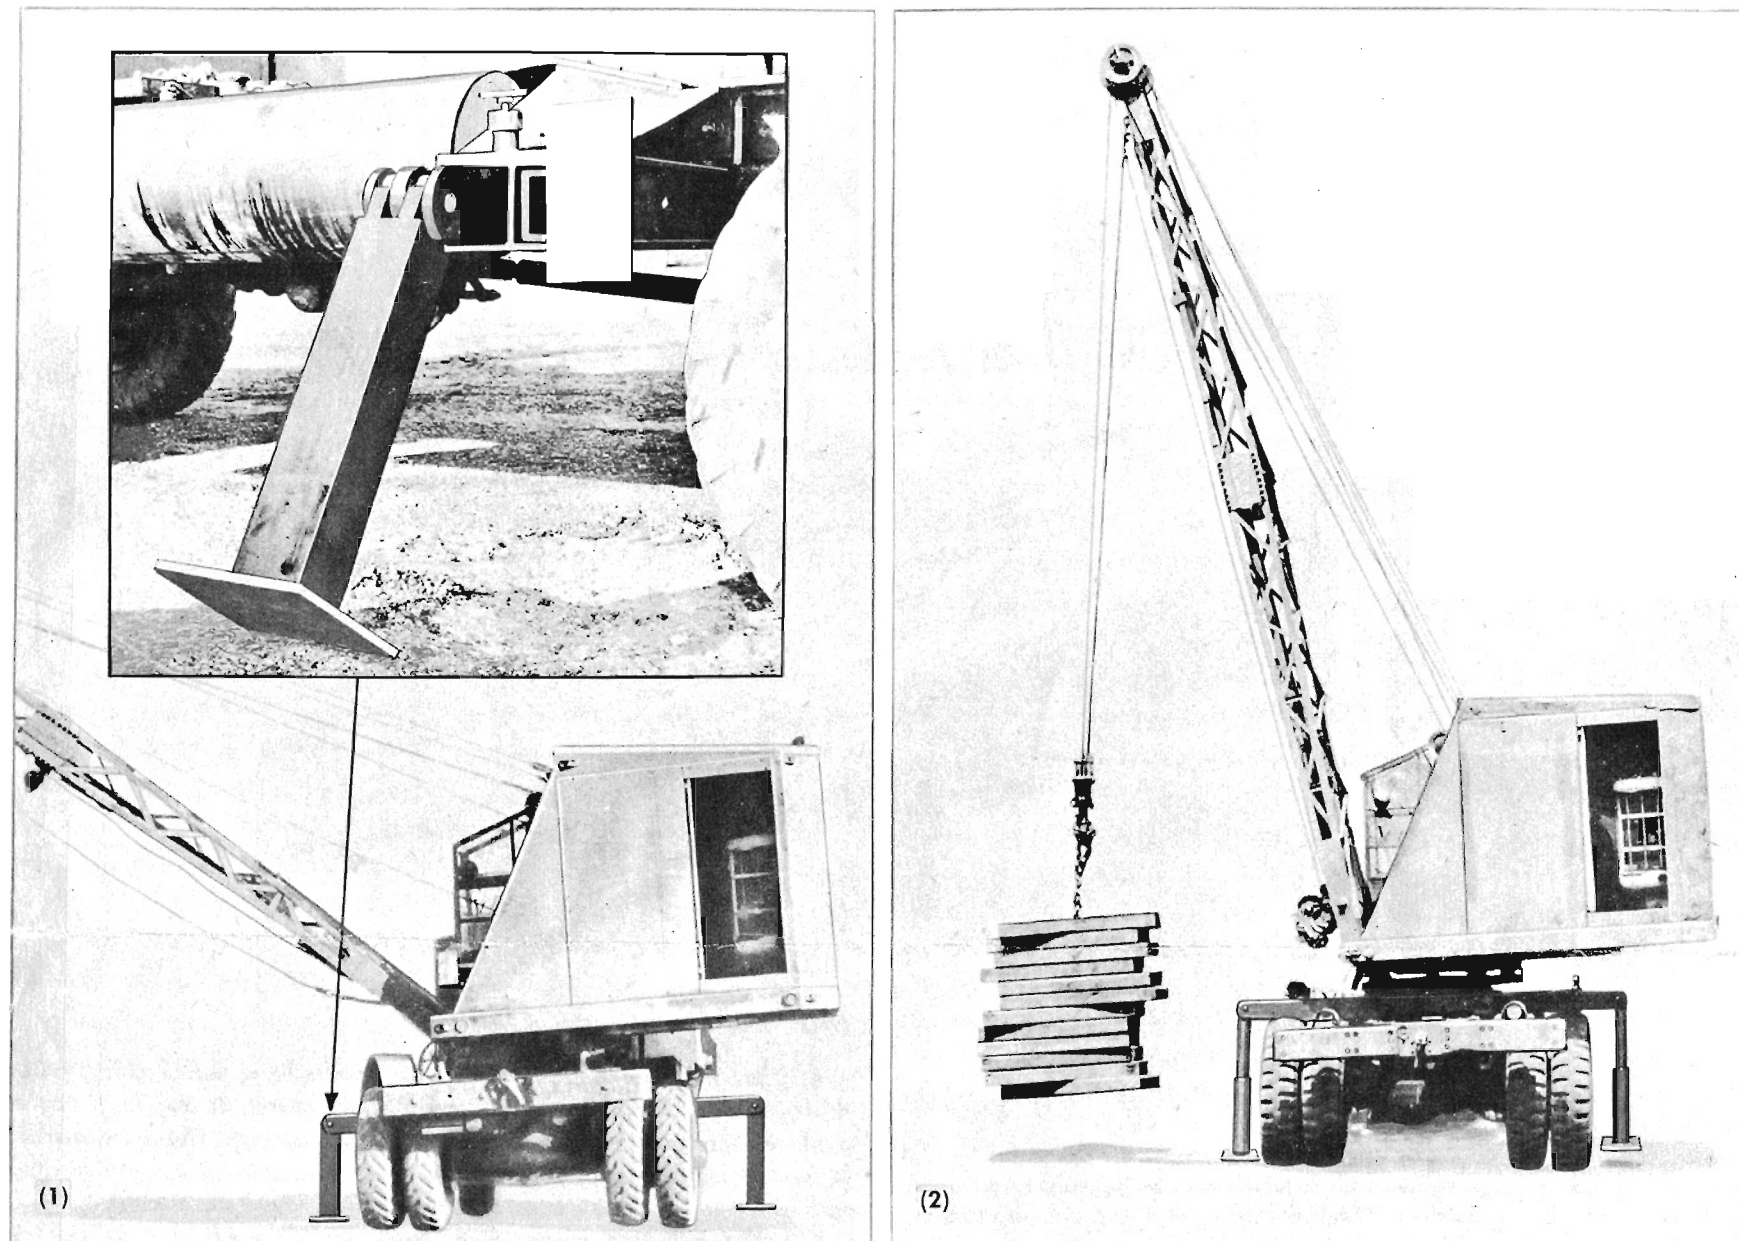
Truck-mounted $\frac{3}{8}$ -cubic yard crane with outriggers lifting test load over the side. Insert shows outrigger details. Outriggers are obtained from depots and installed in the field.
